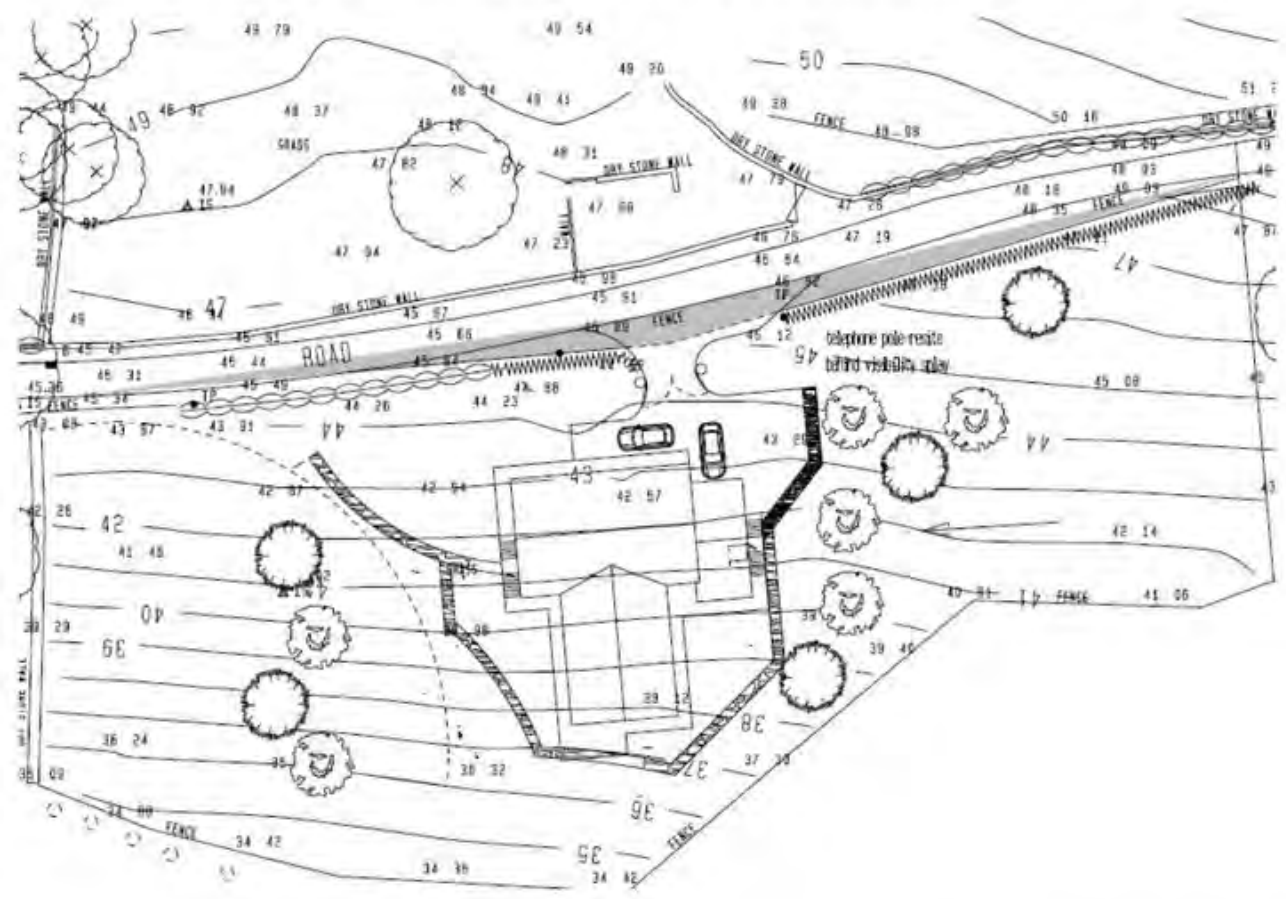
Visibility splay if dwelling was moved closer to existing building. A large section of road side boundary will be removed, which will result in approx 4m high retaining wall to support road.
